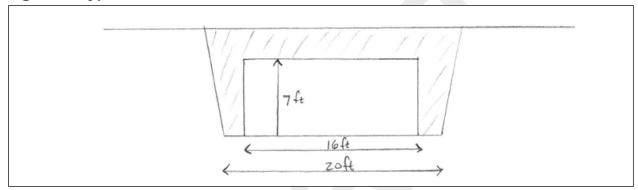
Typical Two-Lane Bridge Crossing Channel Section
